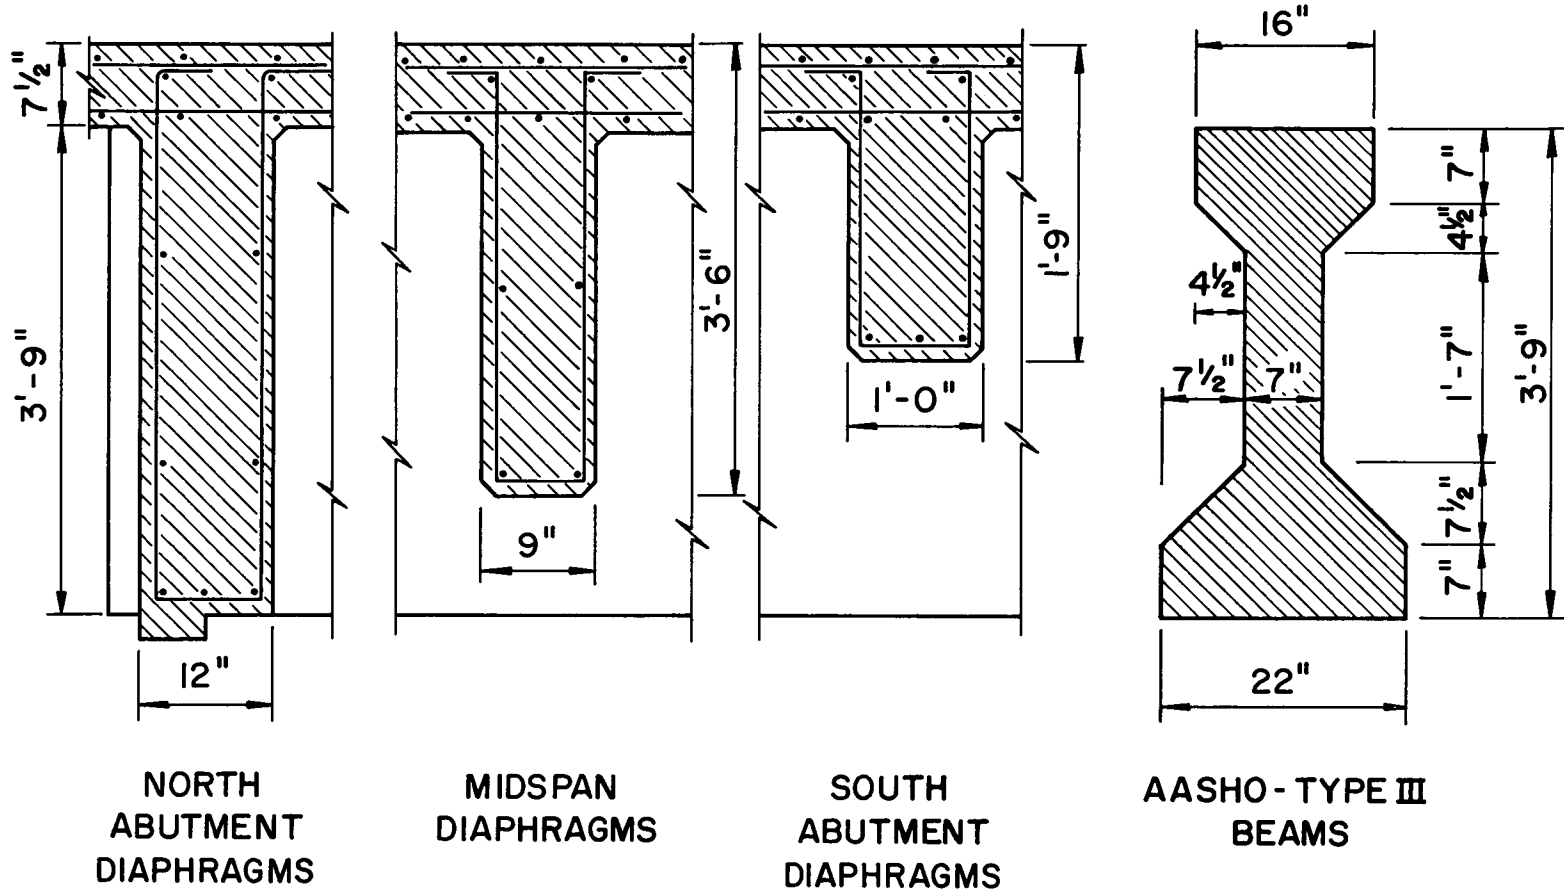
Cross-Sectional Dimensions of Diaphragms and Beams
